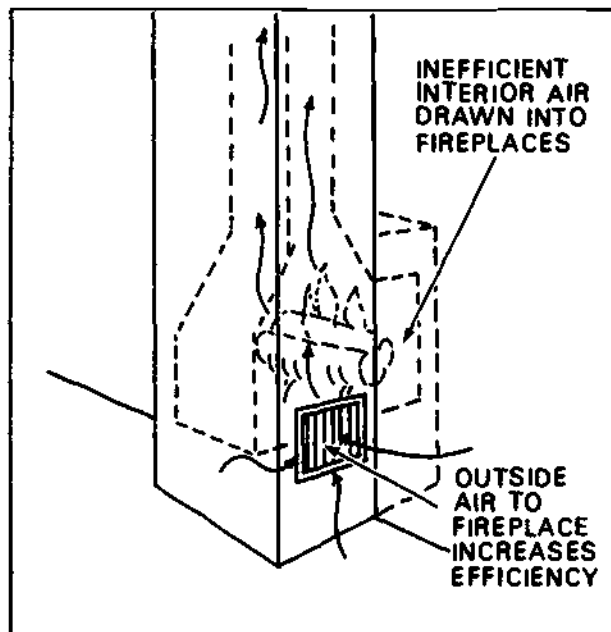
Make-up (outside) air should be provided for fireplaces.
